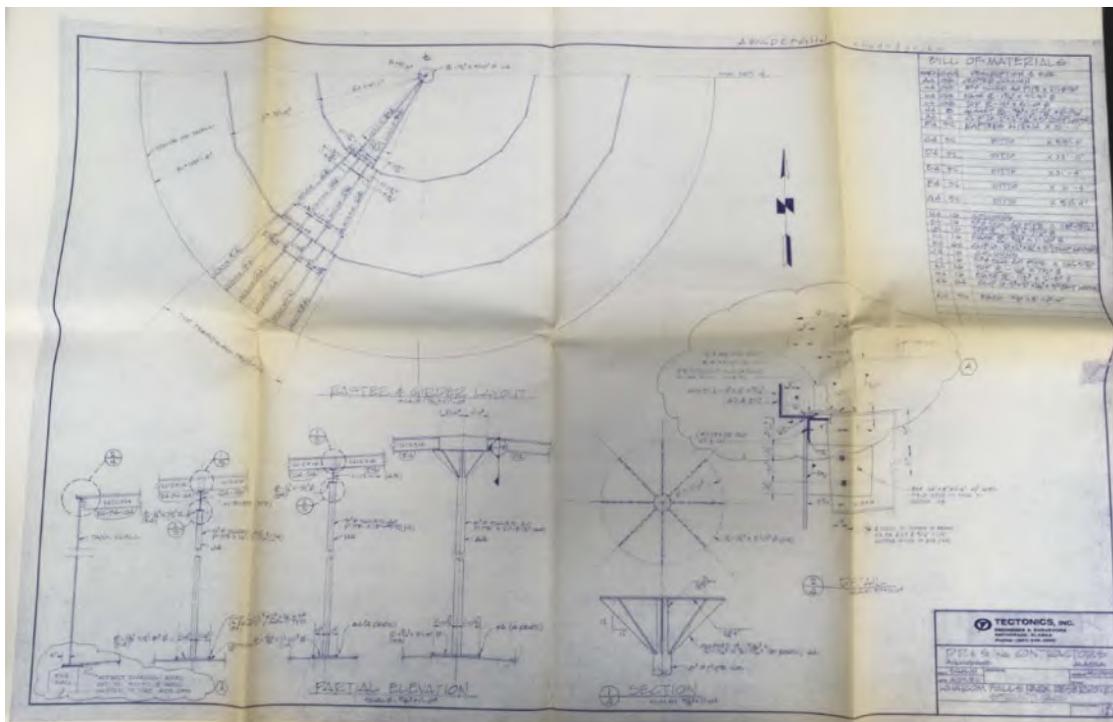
Whatcom Falls 1 – Roof Framing Plan
